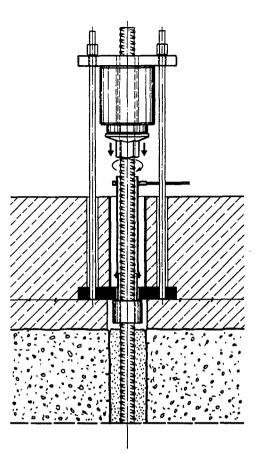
Preloading a GEWI pile against a foundation (DSI, 1992).
